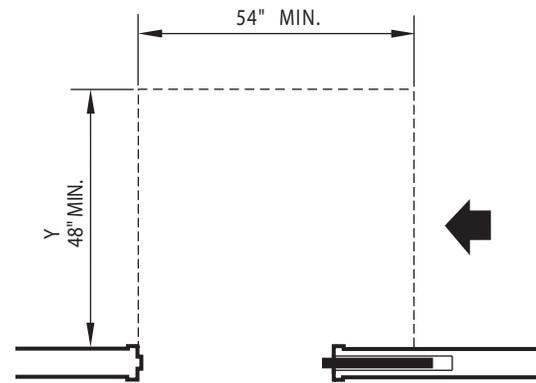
A-8E—SLIDE-SIDE APPROACH - SLIDING DOORS AND FOLDING DOORS
